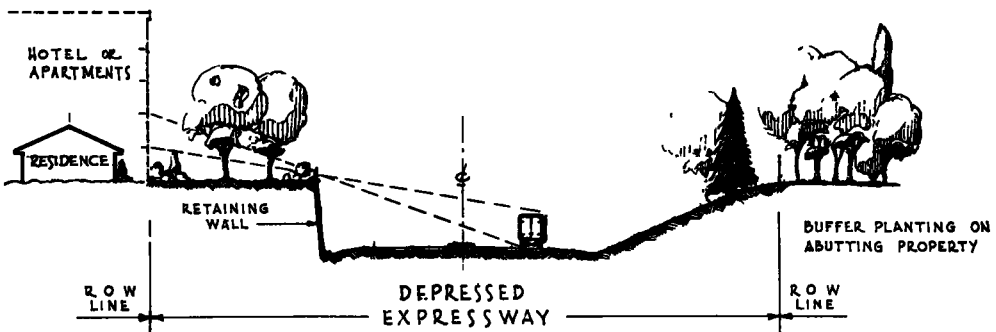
Highway noise was almost inaudible 100 ft. behind retaining wall and top of slope. The distance should be increased for multistory buildings.
